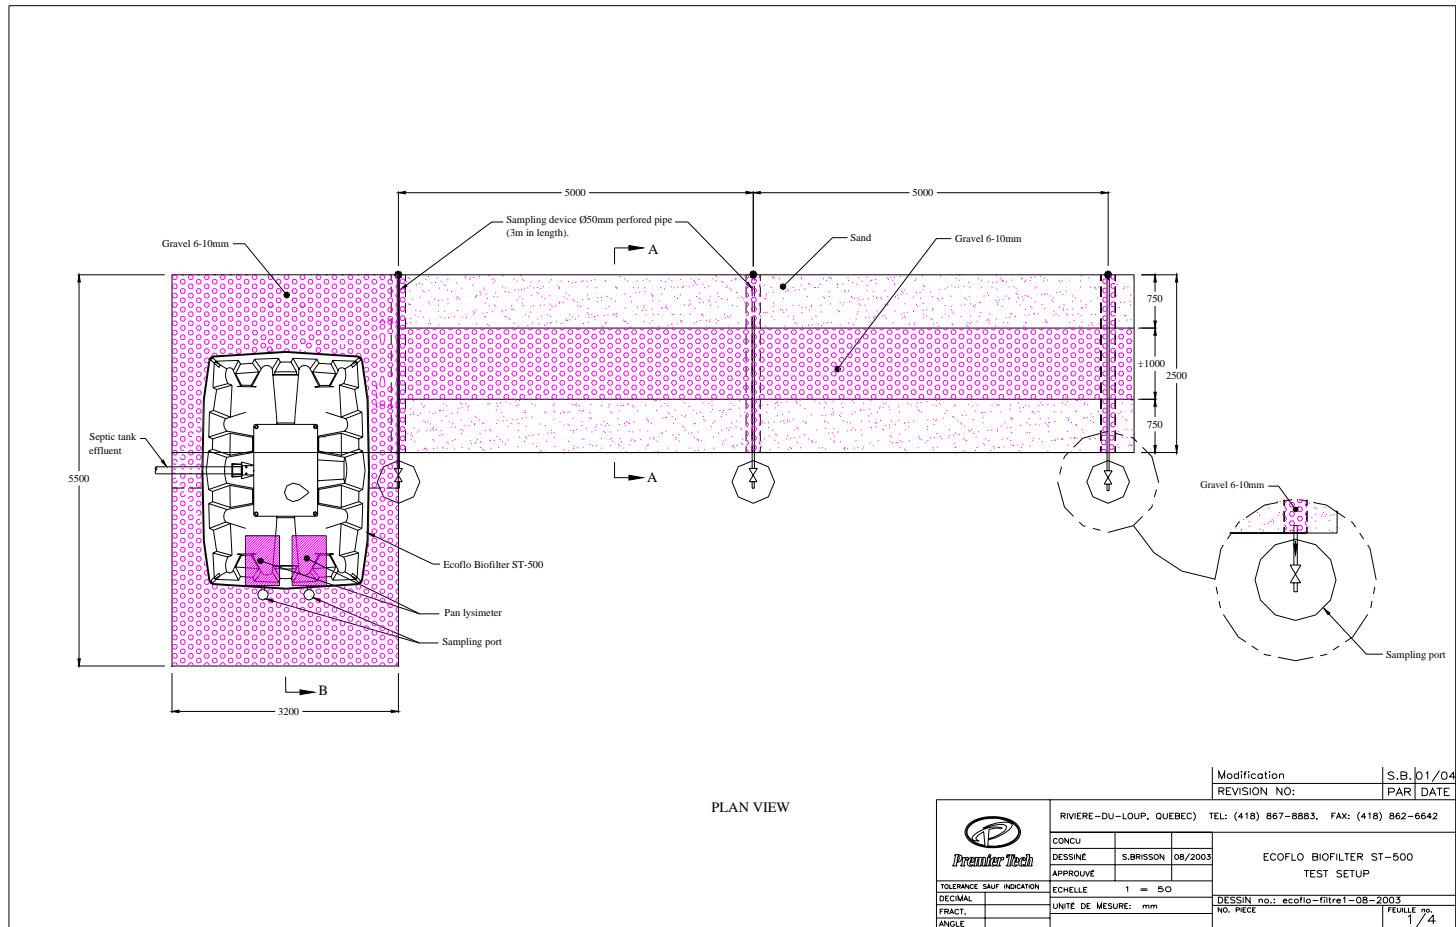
Plan View of the Horizontal Sand Filter tested at ORWC (Site 1)
